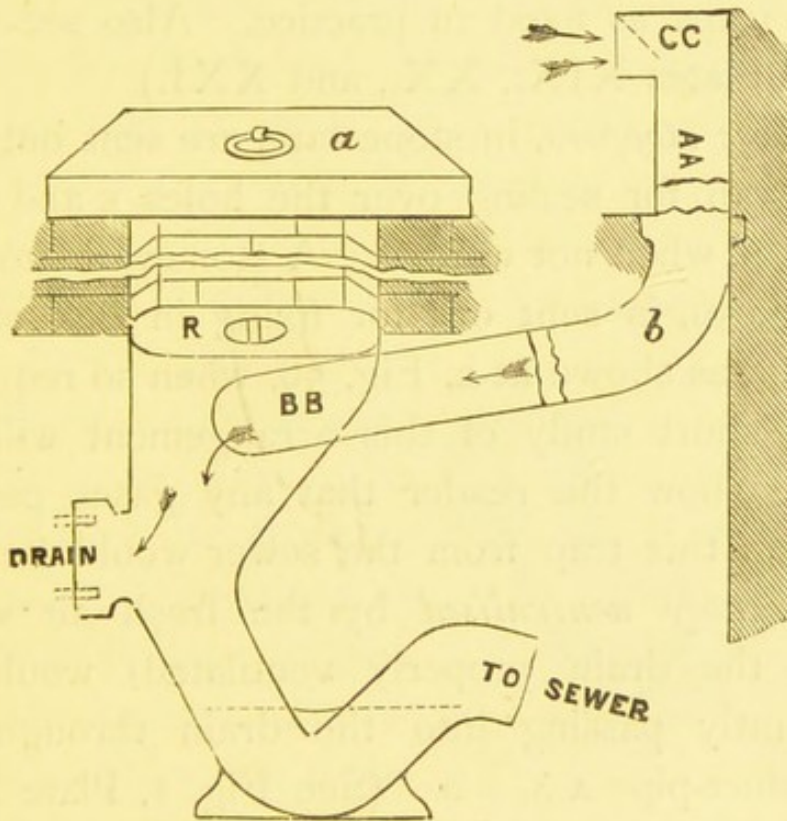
View of a 6-in. "Ventilating Drain-syphon" with Air Induct-pipe.
